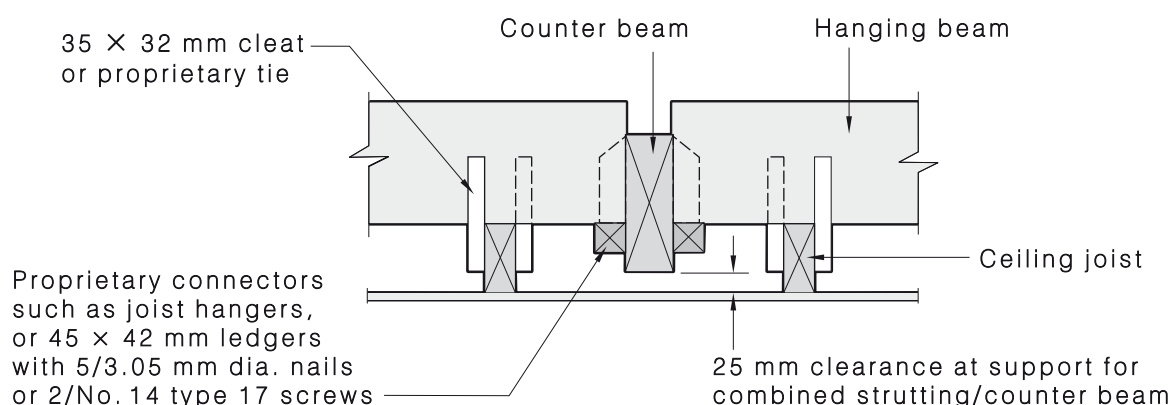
FIXING HANGING BEAM TO COUNTER BEAM
